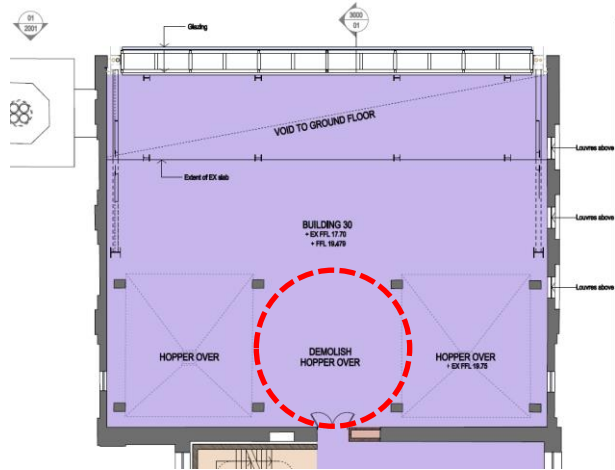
Extract of Level 1 Proposed Plan – proposed hopper to be removed shown circled
